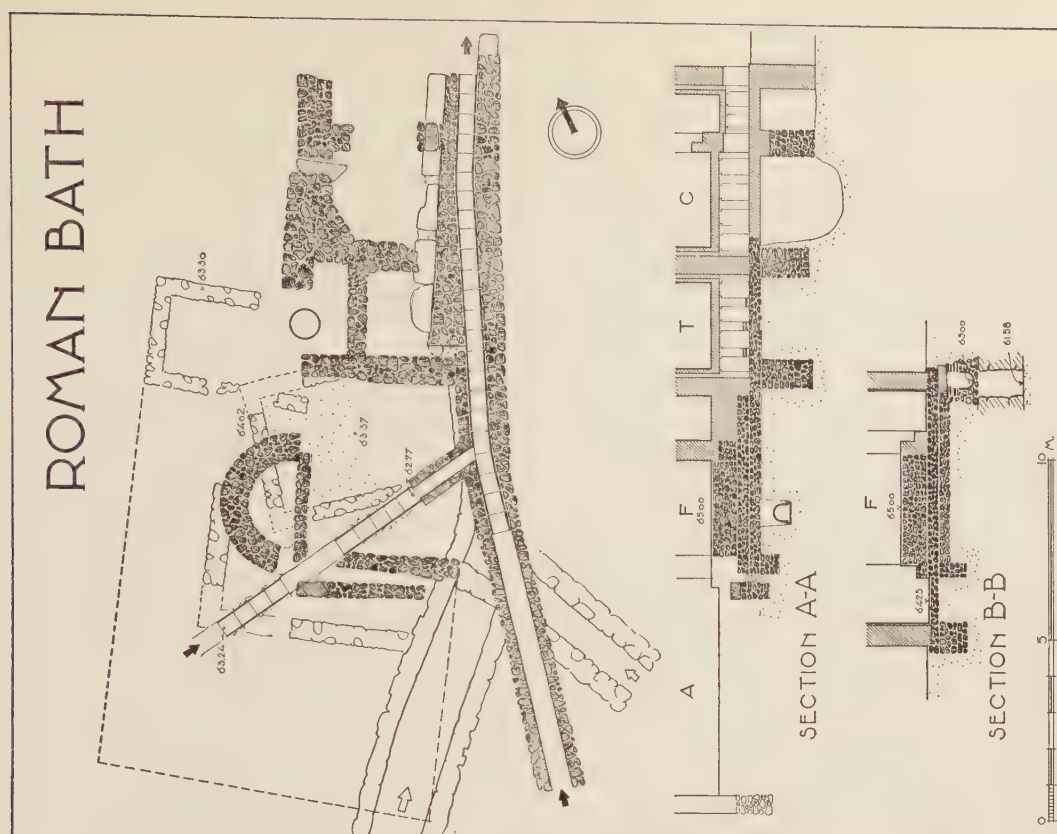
East Bath: Plan of Foundations, and Sections at A-A and B-B (Fig. 25).
